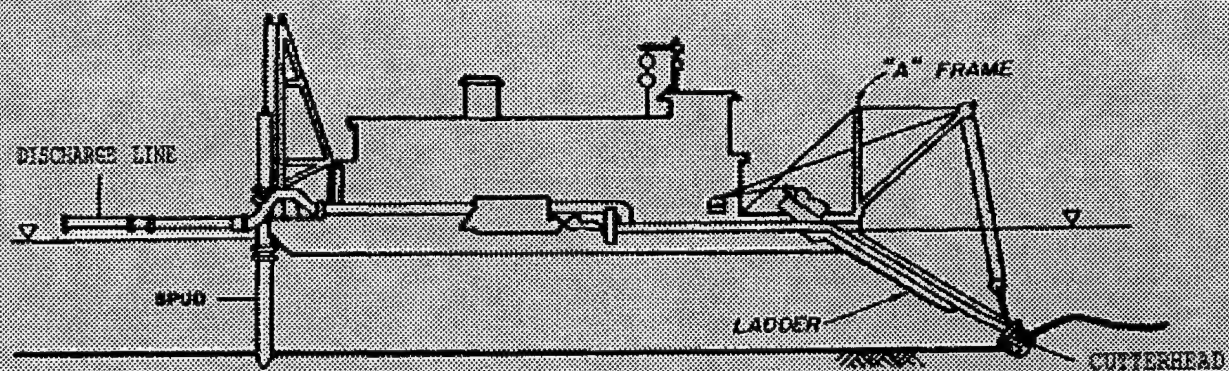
Hydraulic pipeline cutterhead dredge.
